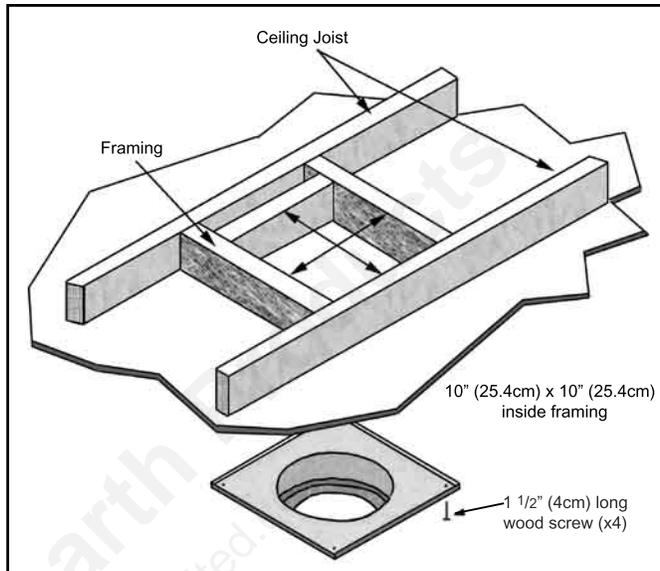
Wall Framing for 10" (25.4 cm) x 10" (25.4 cm) Hole for Vertical Installation.
